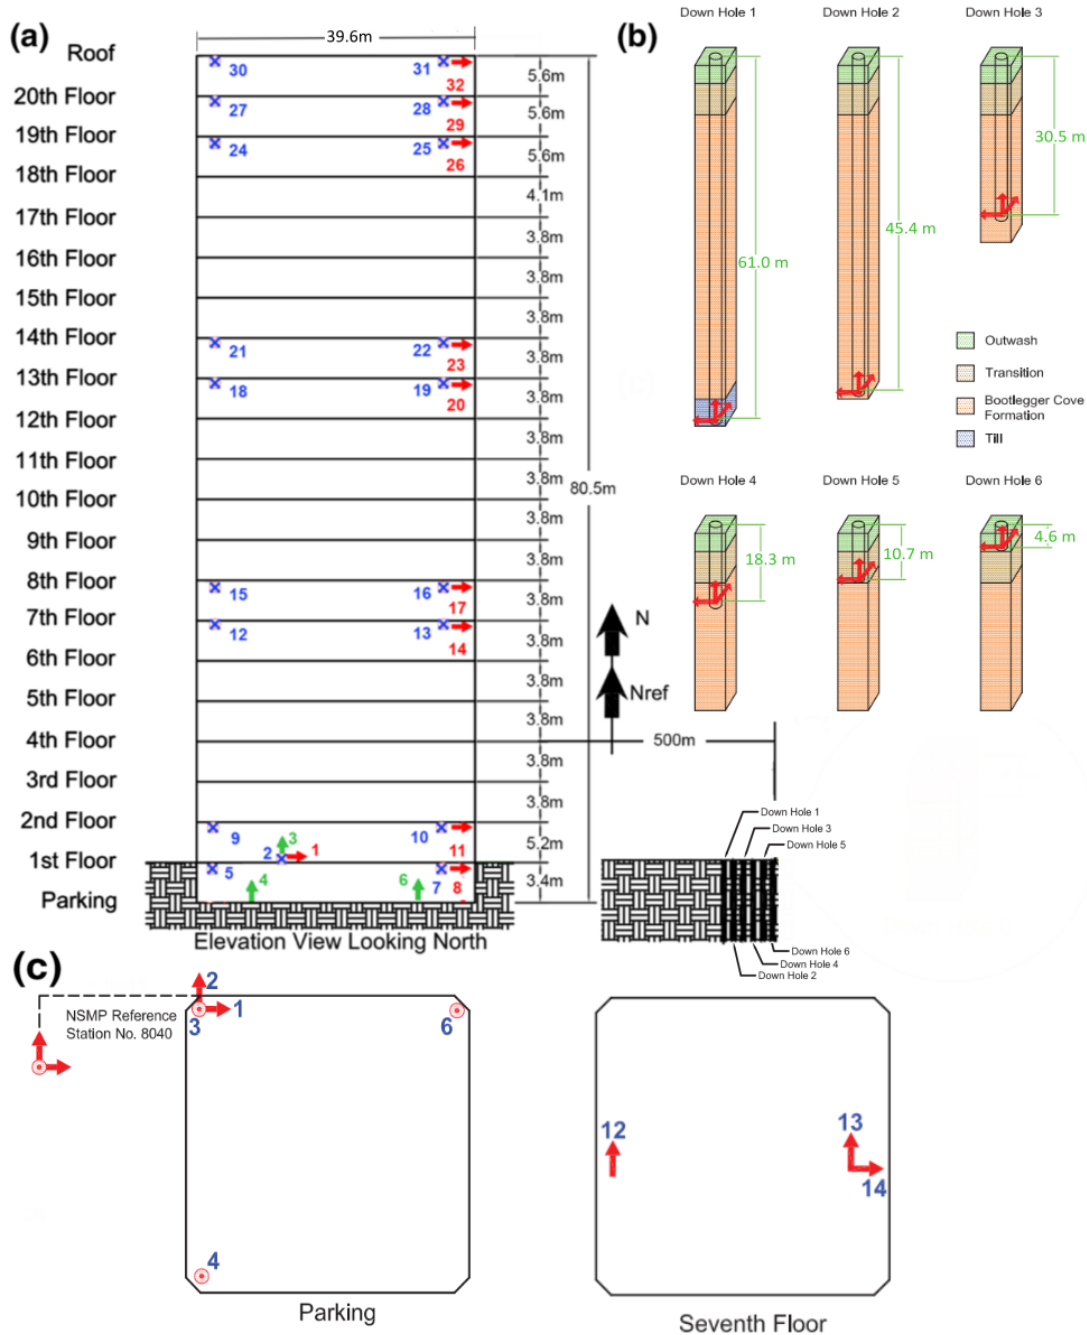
Layout of structure array throughout the building (a), site array with the different boreholes (b) and detail of the parking floor and of a typical instrumented floor (c), adapted from [24] and [8].
